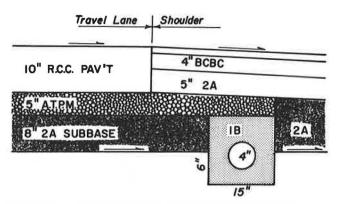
Pavement cross section (asphalt treated permeable material test area).
